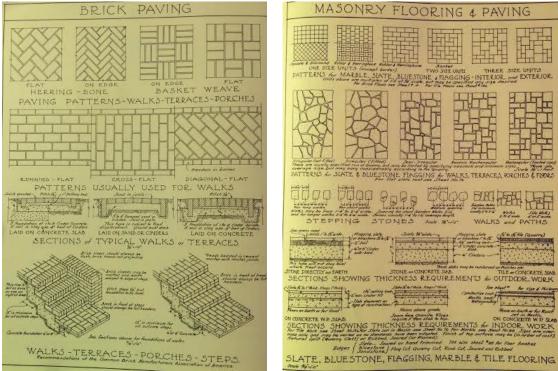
Masonry Flooring & Paving (1932 Ramsey, 5)
